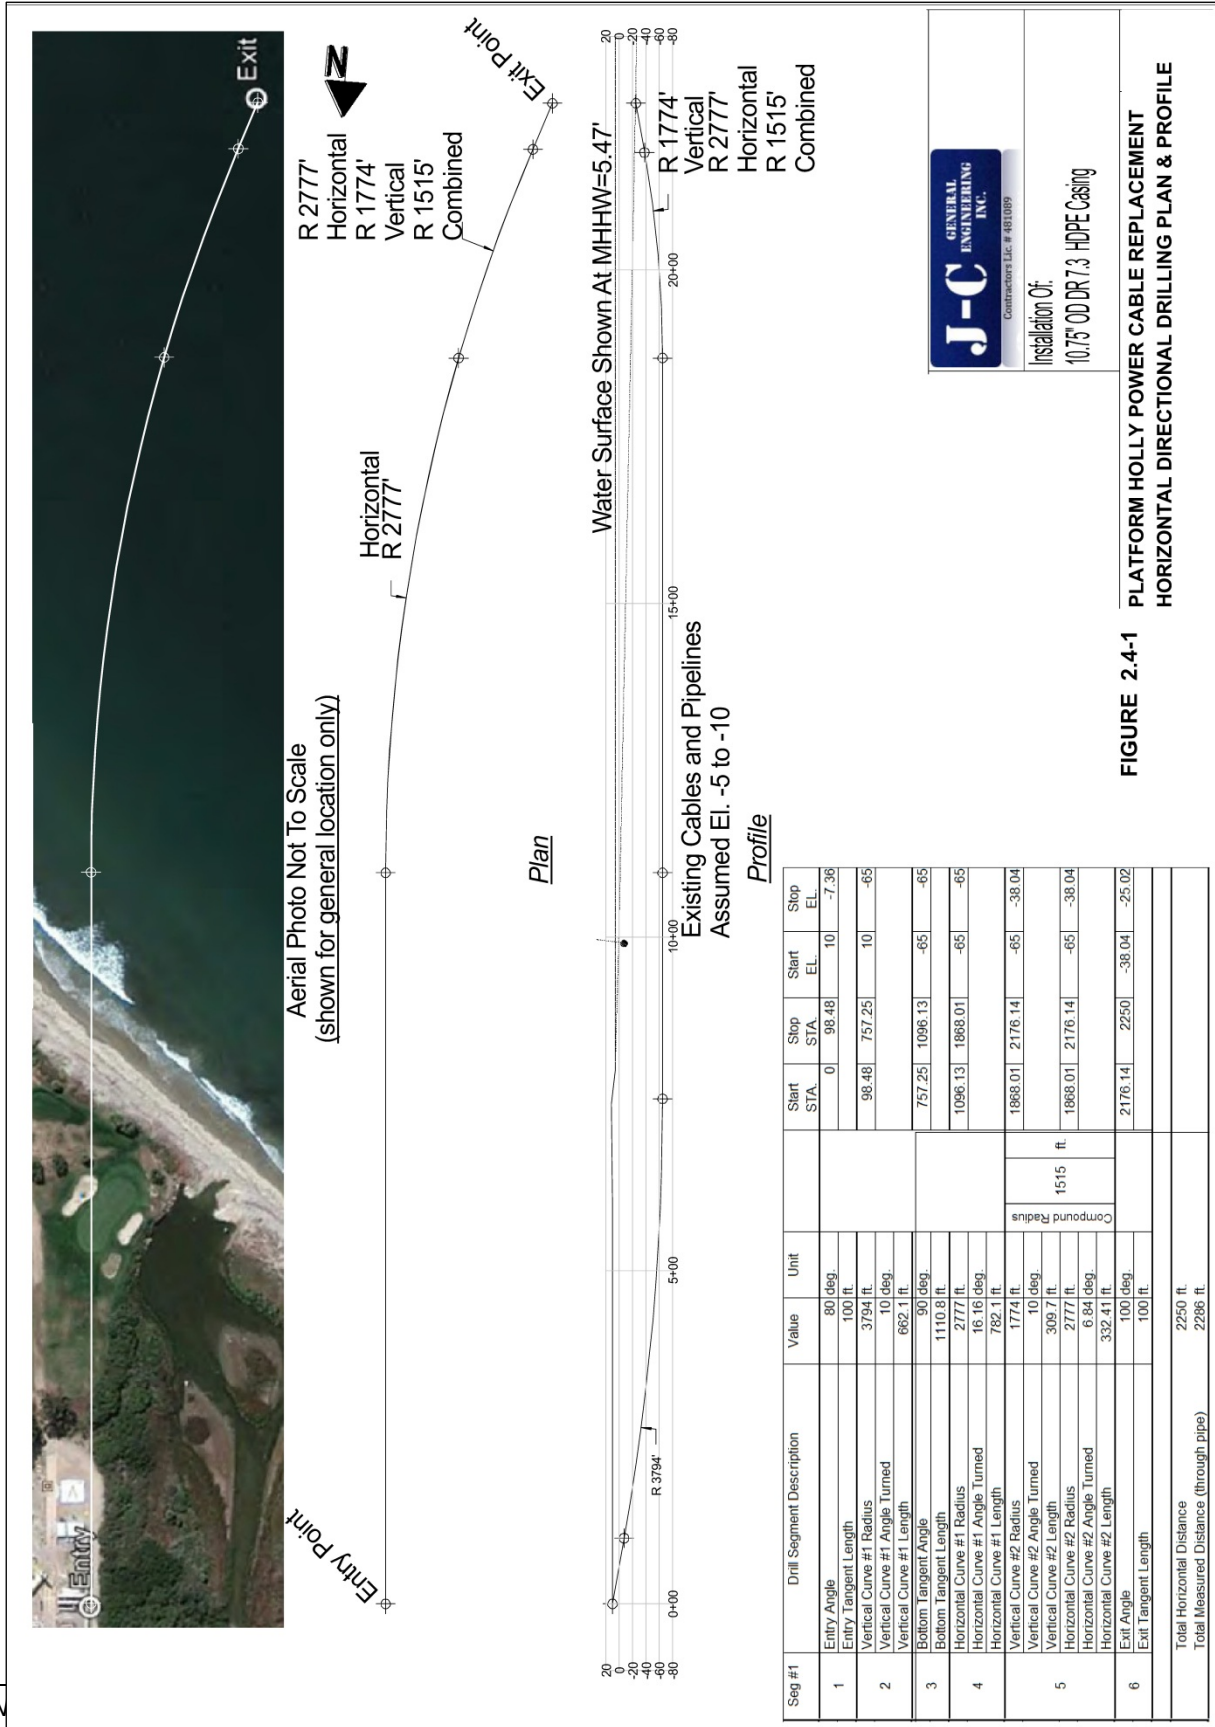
PLATFORM HOLLY POWER CABLE REPLACEMENT HORIZONTAL DIRECTIONAL DRILLING PLAN & PROFILE
